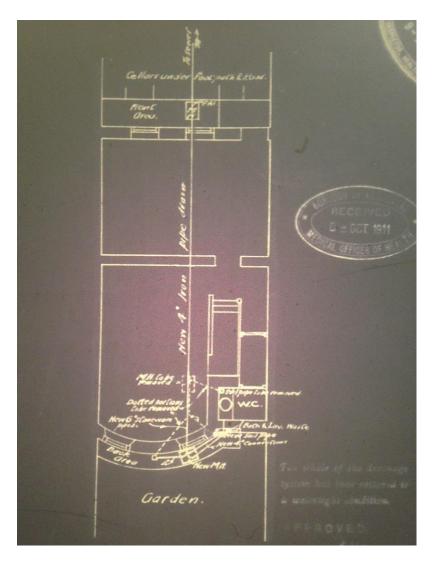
1911 drainage plan: lower ground floor¹¹
